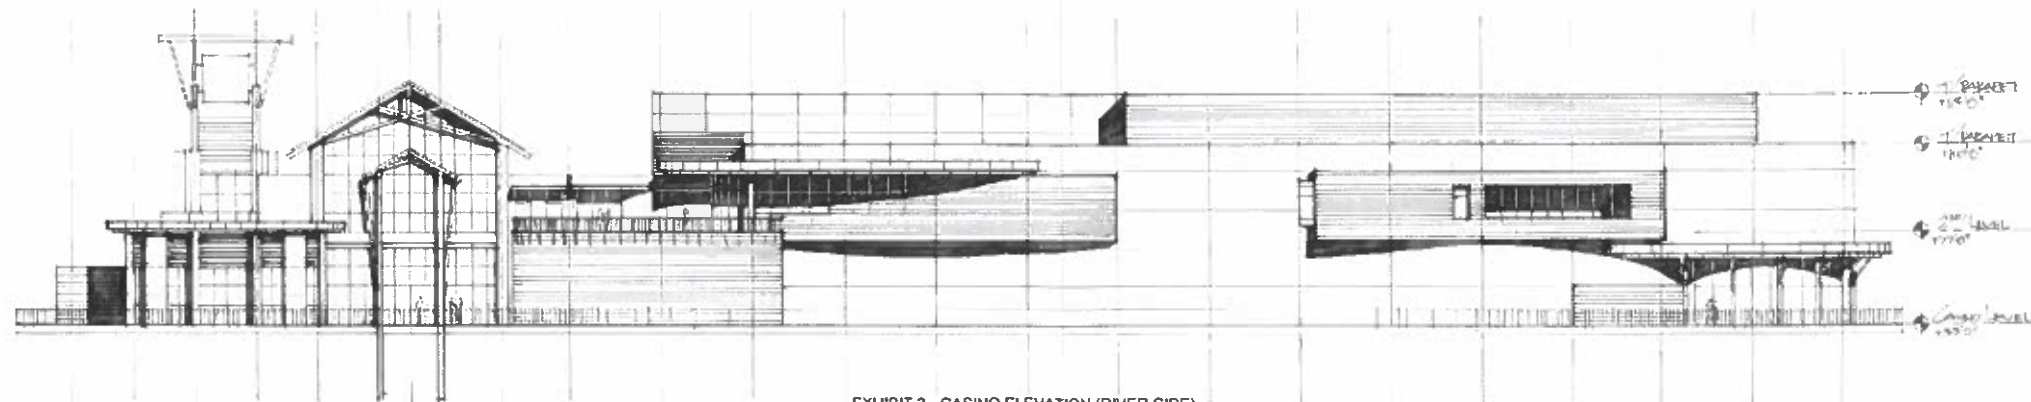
CASINO ELEVATION (RIVER SIDE)
